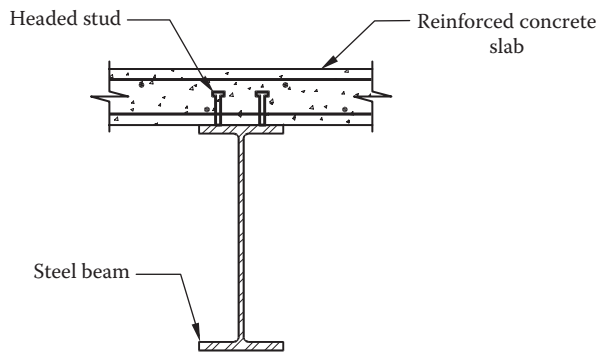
Composite beam with flat soffit reinforced concrete slab.
